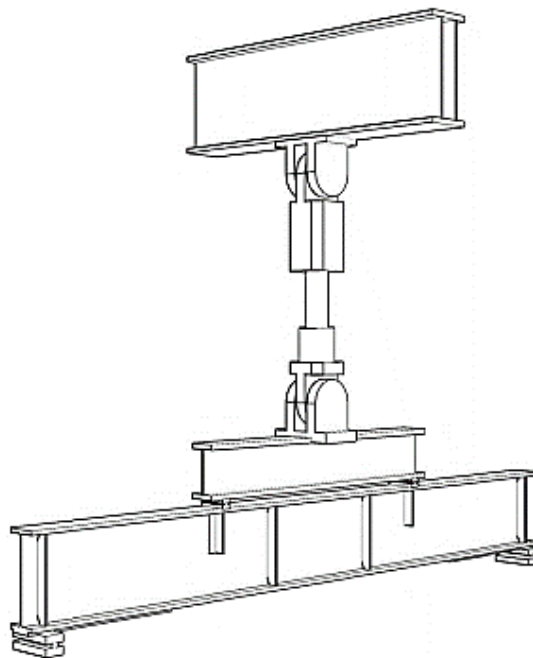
Specimen with 1 Hydraulic Actuator and Spreader Beam
